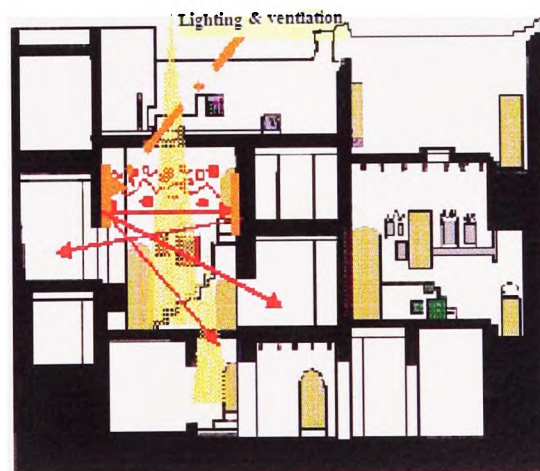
Longitudinal section in Ghadames's houses shows the different levels and the concept of lighting and ventilation.
